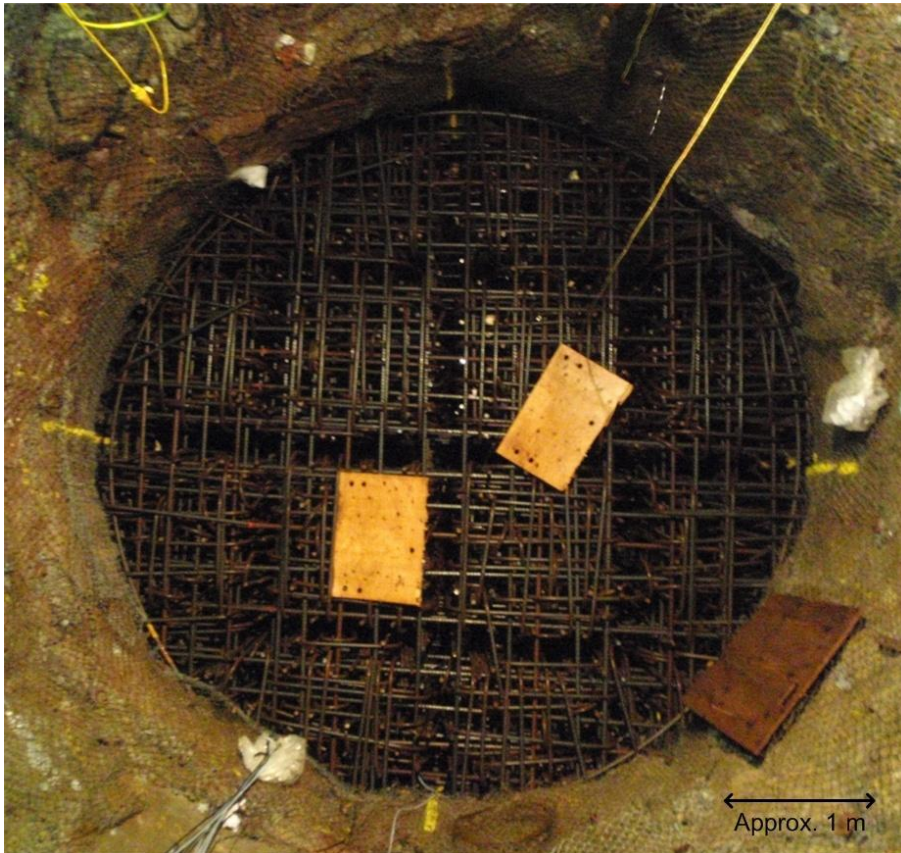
Top view of rebar in the bottom concrete component (AECL stock photograph)
